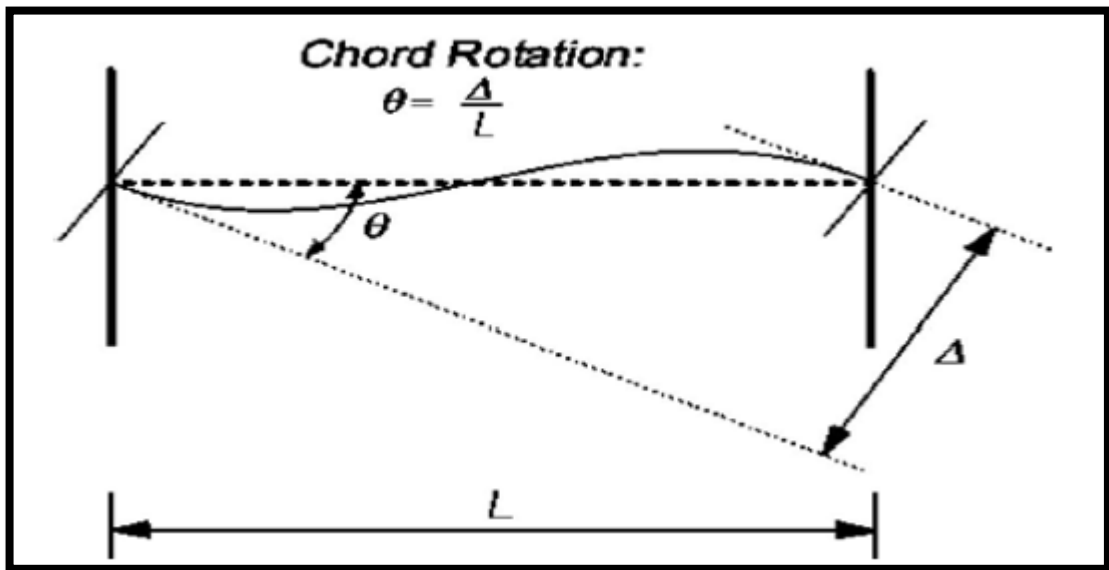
9: Chord rotation for structural wall coupling beams (ASCE 7-16,2016).
